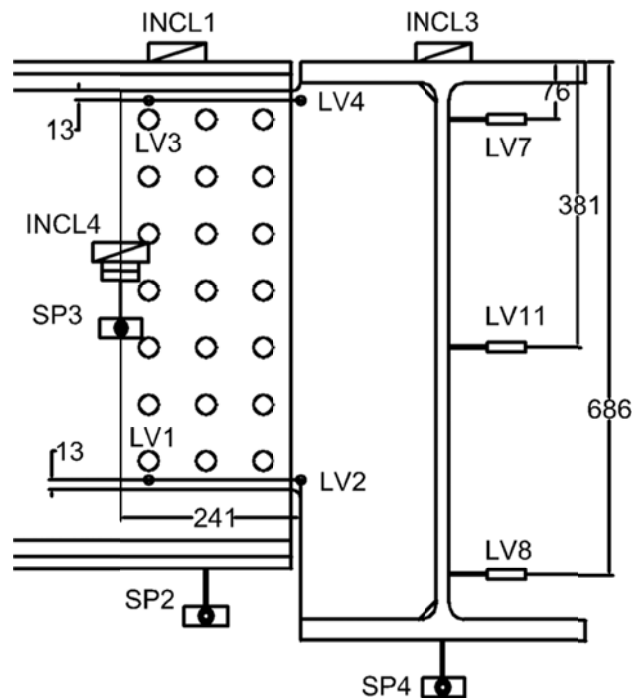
Out of Plane LVDT Layout, Configuration 12
